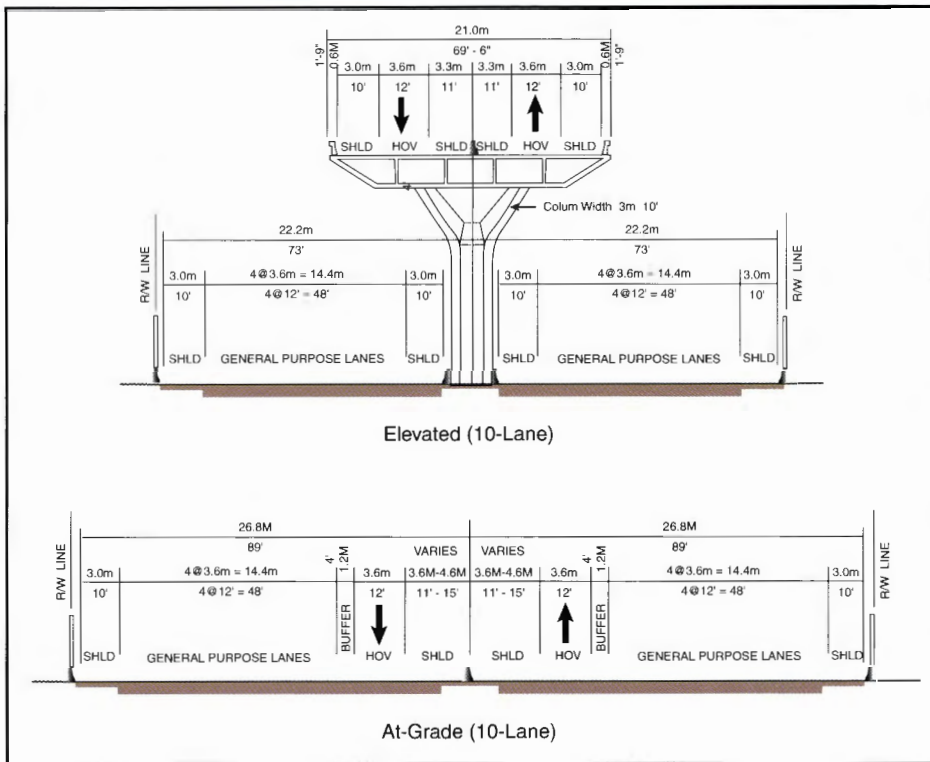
Alternative 4 At-Grade and Elevated Cross Section
